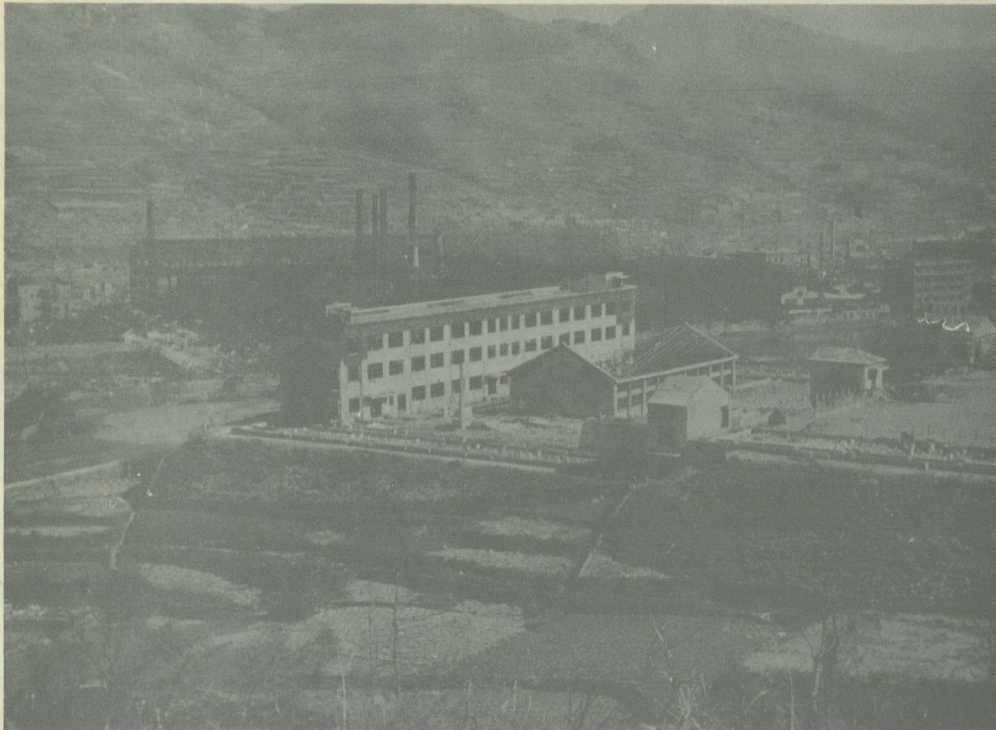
(11N). Fuchi School. 1000 meters. General view looking south-east over damaged area. The school is in the center of the picture. The foundation stones of the wooden portions which were totally demolished can be seen. (Photo File # NG 117.)
